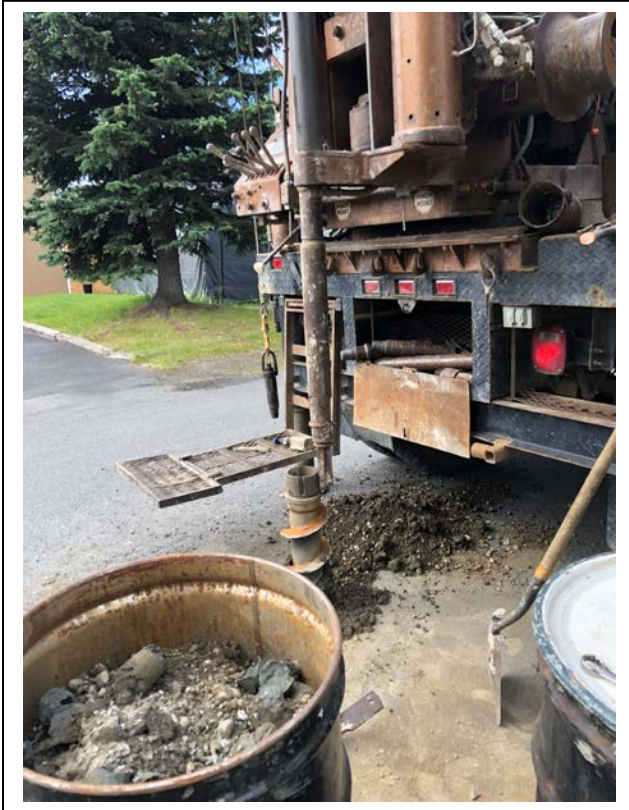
Looking southwest at the advancement of Boring B-45. (June 30, 2020)
